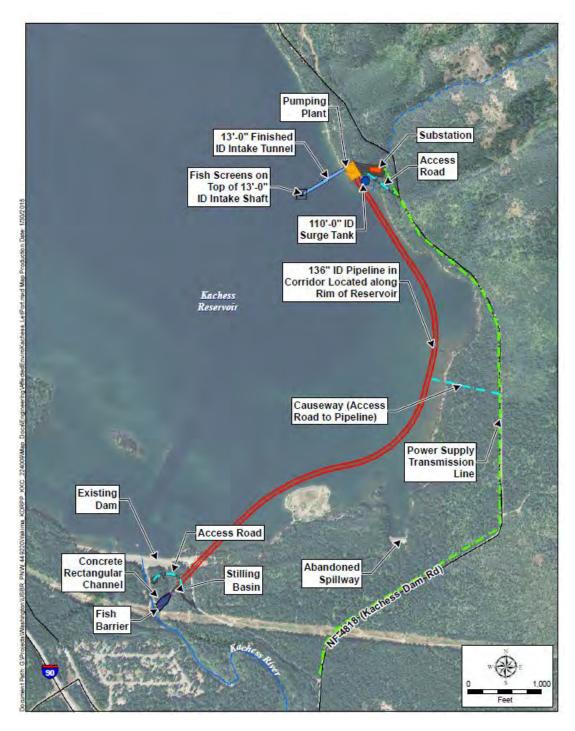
Plan View of Alternative 1, East Shore Pumping Plant
